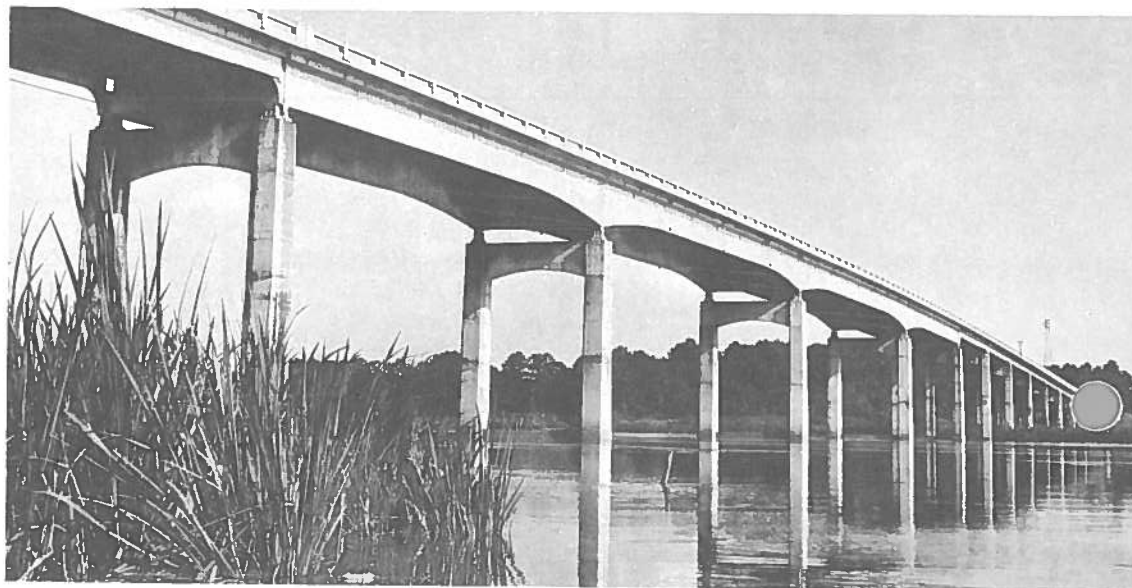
CONTINUOUS RIVETED PLATE GIRDER BRIDGE WITH FLOOR BEAMS, GEORGIA
